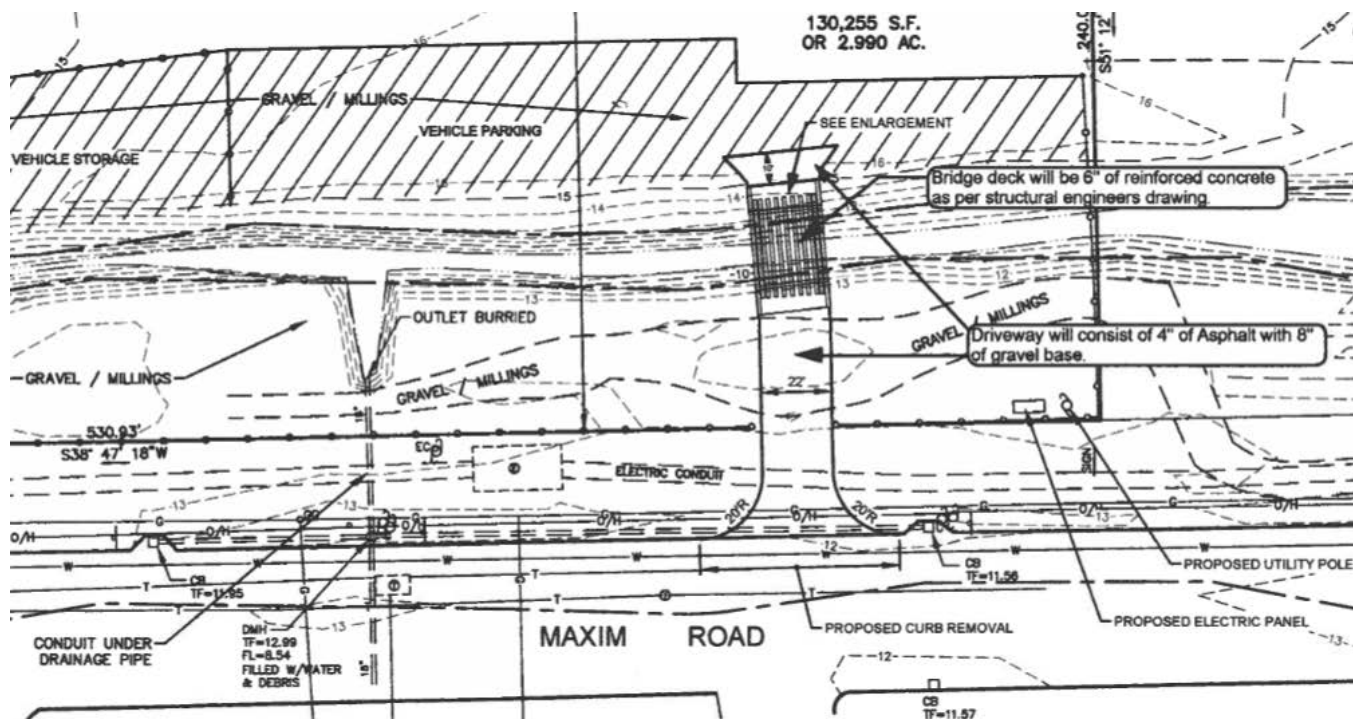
Enlargement of Site Plan, shows new bridge and driveway location across existing inland wetlands, as flagged by Soil Scientist.
